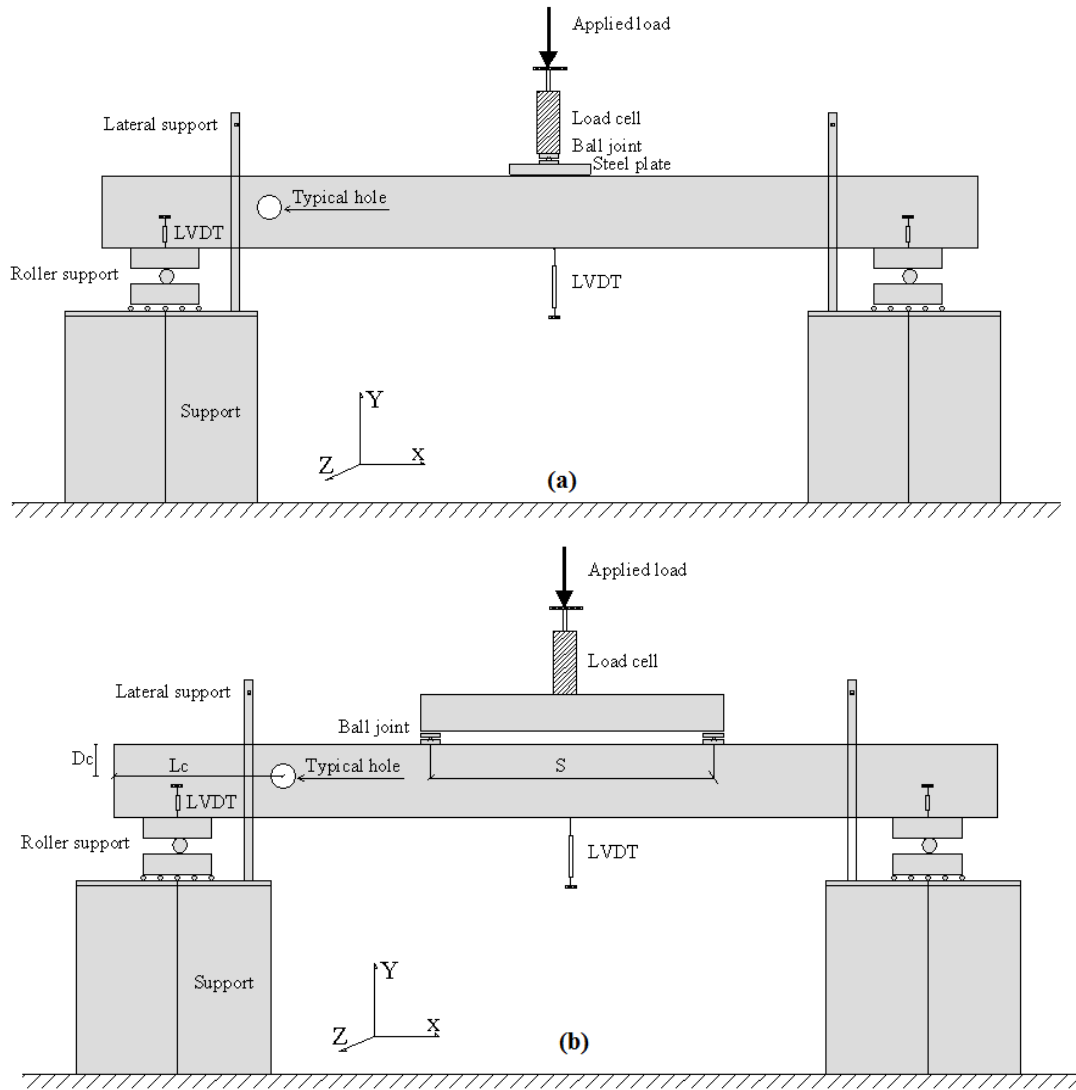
Schematic drawing of experimental setup: (a) 3-point, (b) 4-point bending tests
